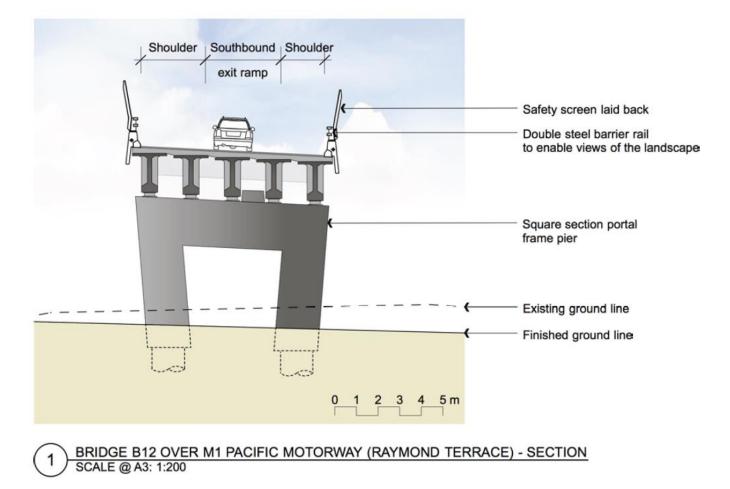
Indicative drawing of a bulb-T girder bridge structure (B12)
